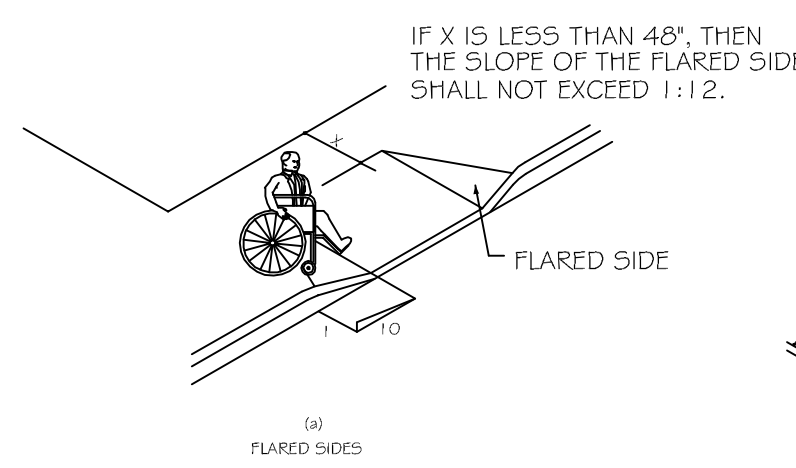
SIDES OF CURB RAMPS N.T.S.
